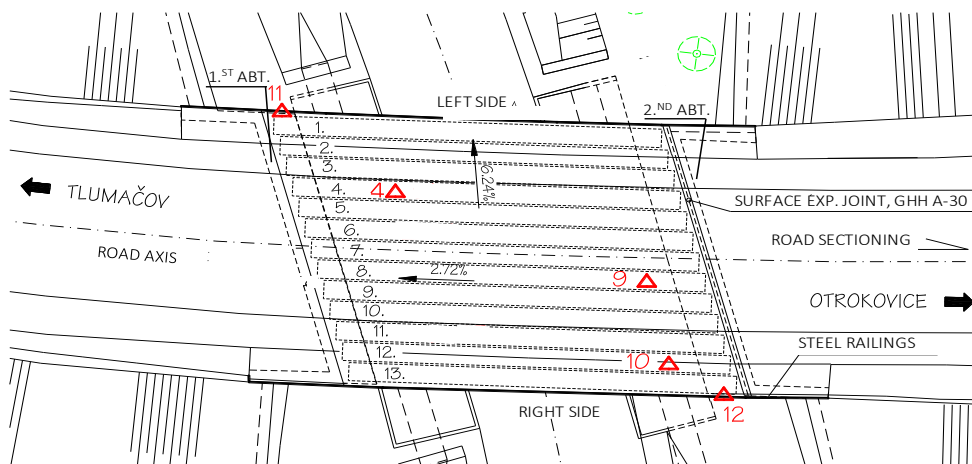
Bridge 55I-026a – Layout and sampling [12].
